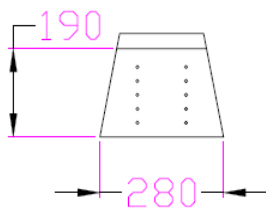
Sketch of modeled prestressed concrete sleeper
